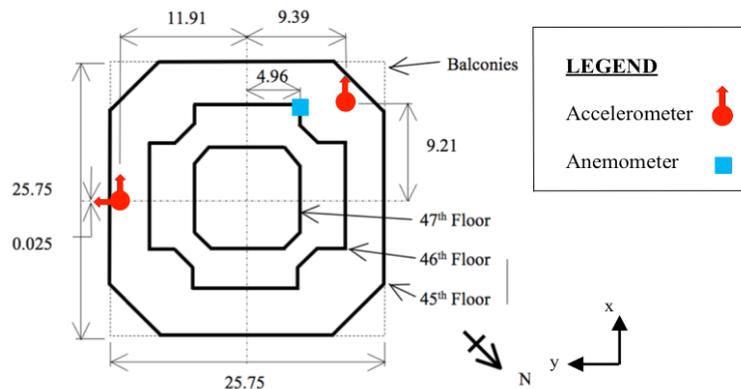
Plan of the top three floors of tower showing locations of instruments and local coordinate system (dimensions in m).
